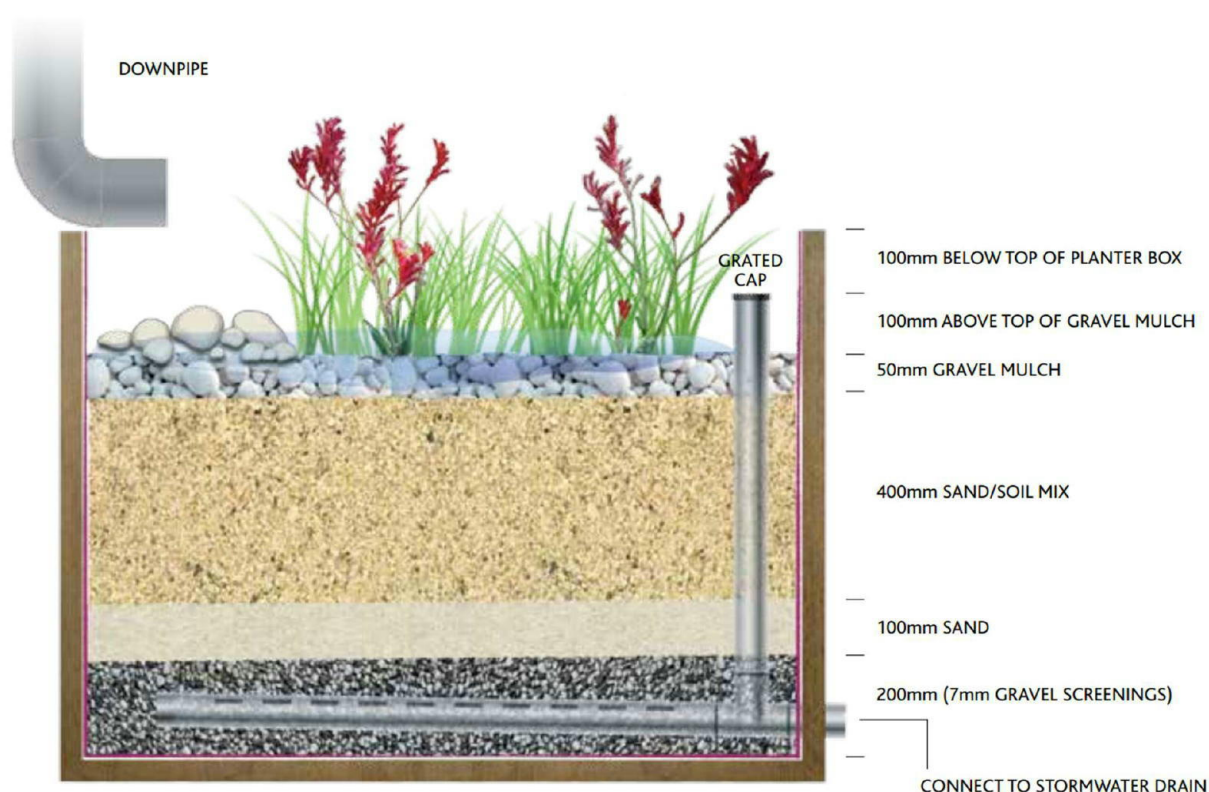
Typical Cross-section of a planter box raingarden (Source: Melbourne Water - Building a planter box raingarden)
